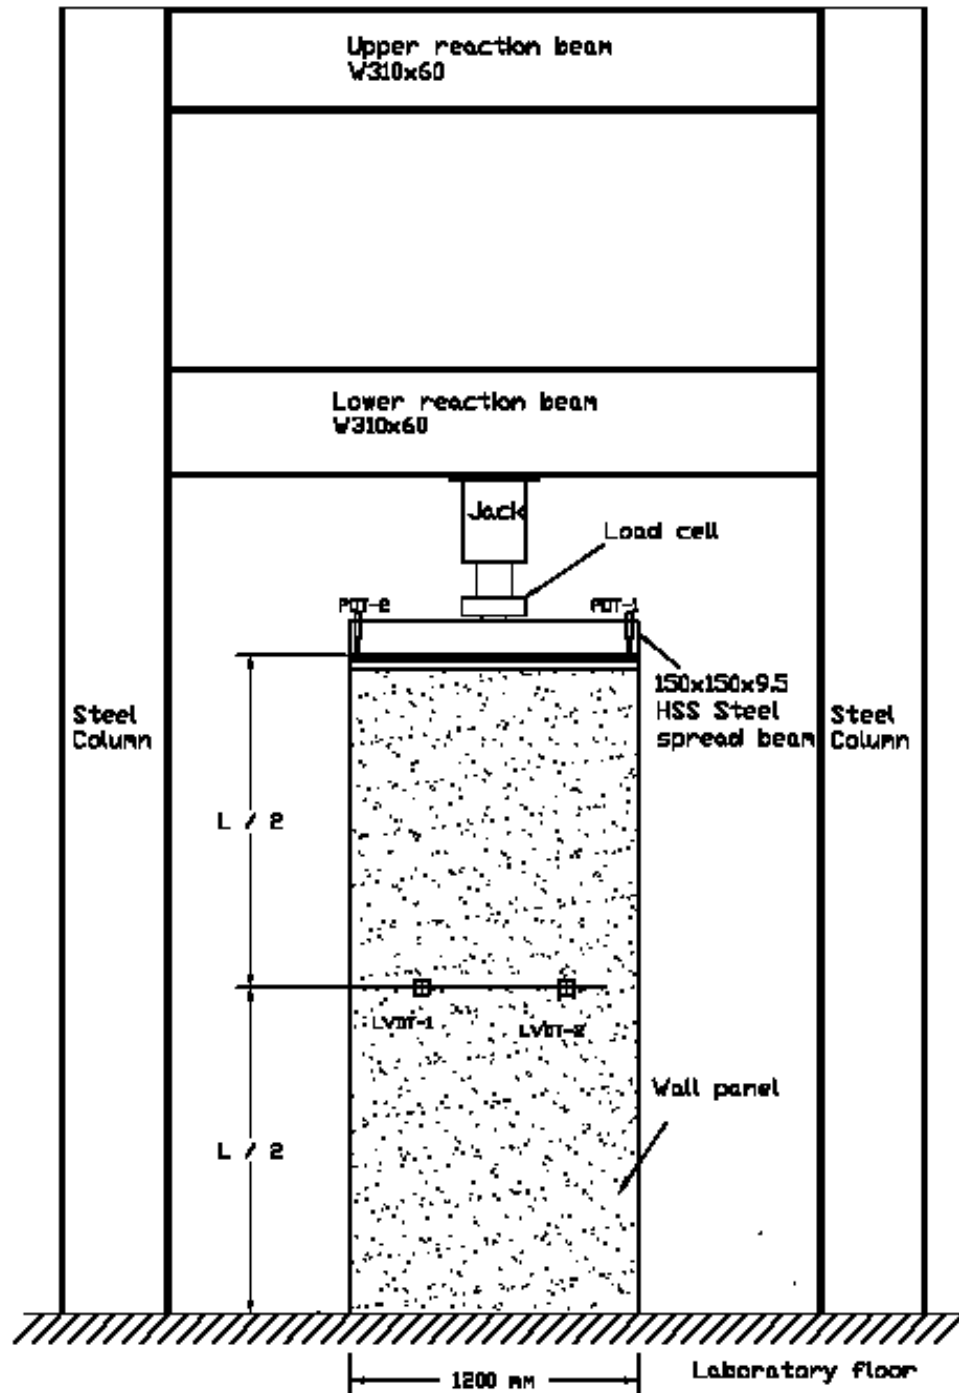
Schematic diagram of the elevation of the test setup for axial loading test
